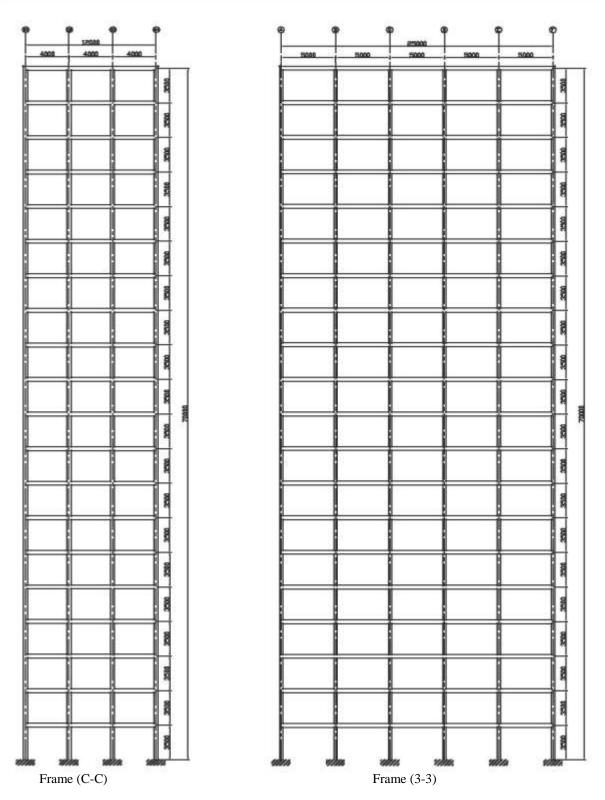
Frame (C-C) and (3-3) 0f twenty-st0ry regular R.C. building (all dimensi0n in mm)
